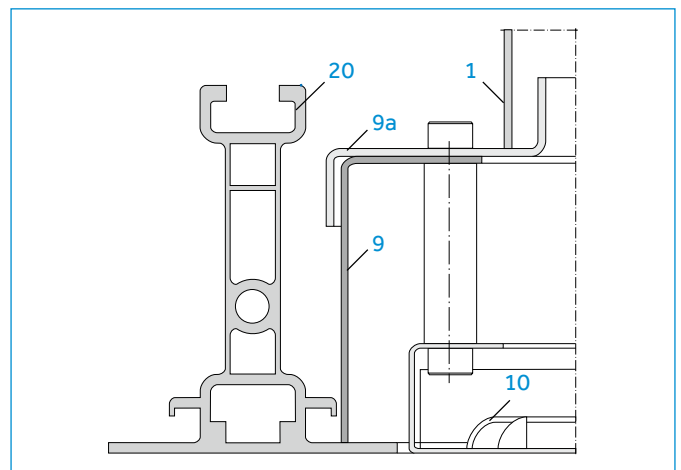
Installation situation with ceiling installation frame 9 and intermediate profile 9a in ceiling grid profile UFR 55/70 T/P
